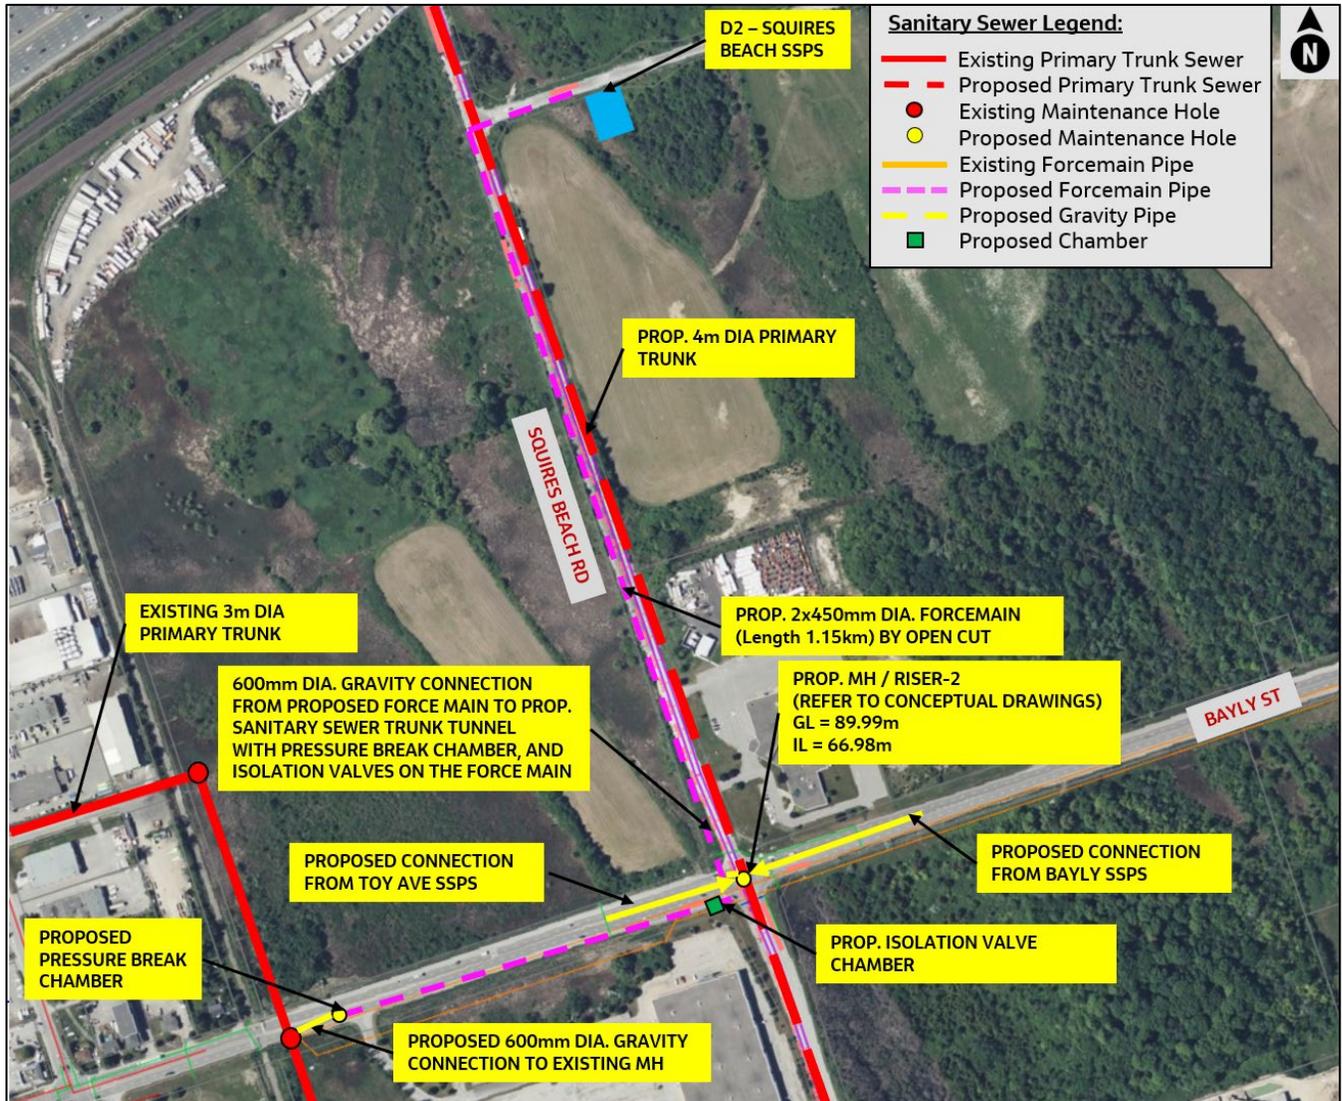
Connection of Squires Beach SPS to the Existing and Proposed Primary Trunks
